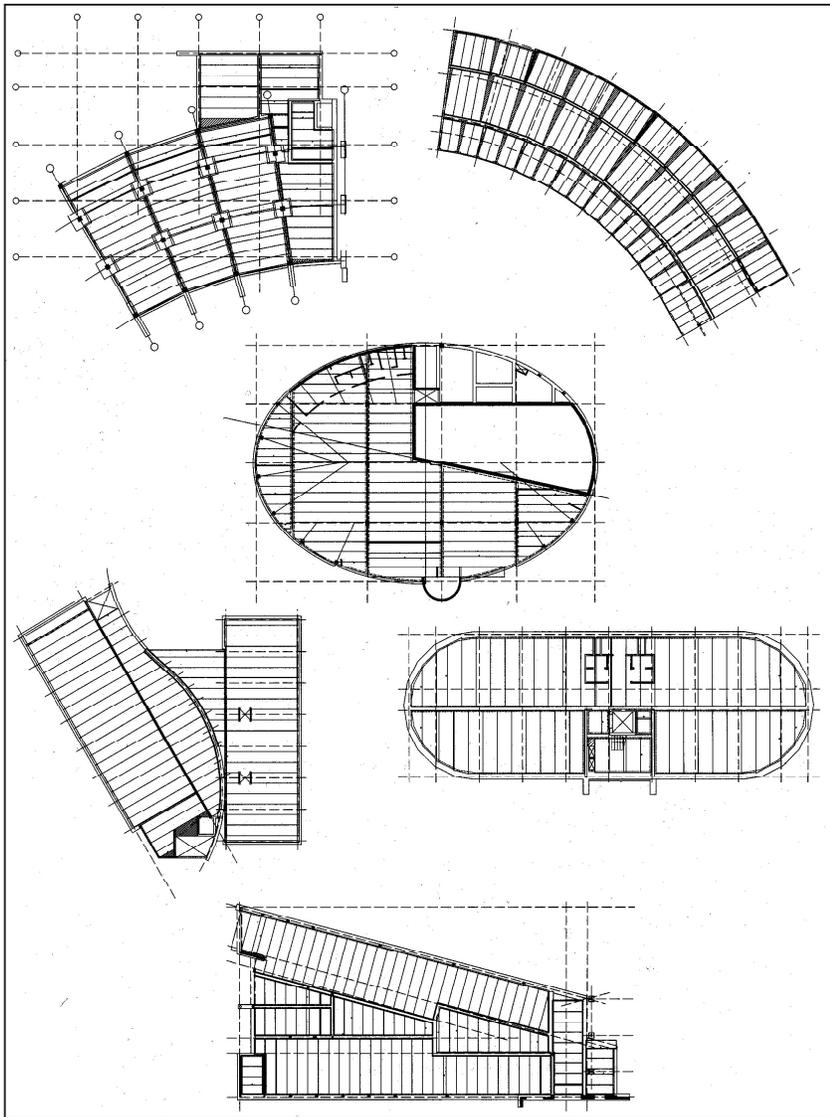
Irregular ground layouts are also suitable for precast concrete construction.
